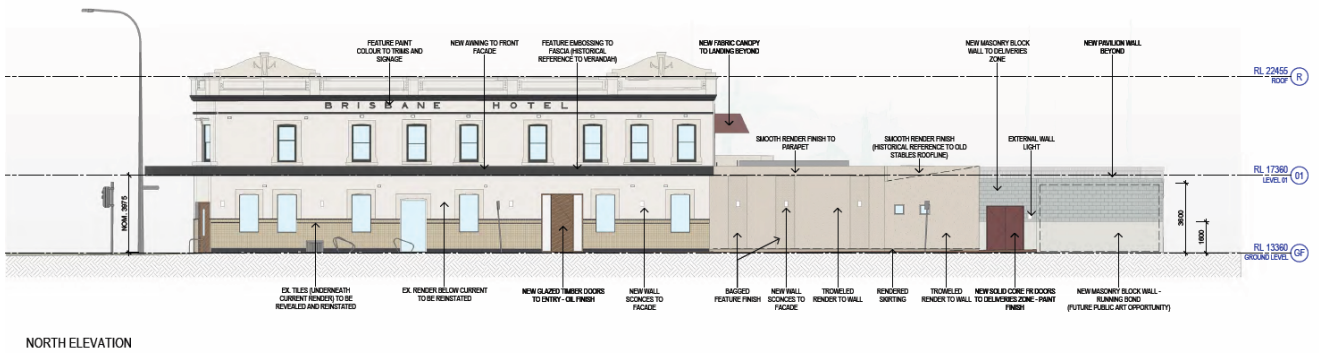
Brisbane Street Elevation Source: Woods Bagot
